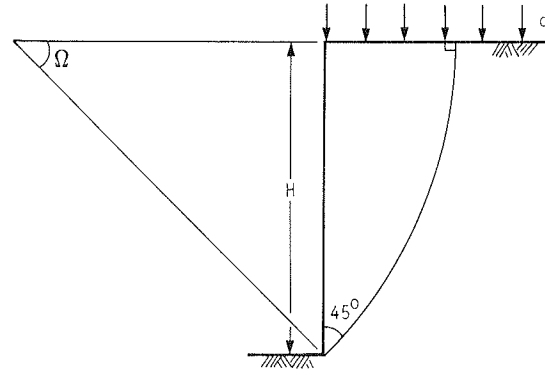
Failure surface in a geotextile-reinforced wall with an uncracked cohesive soil backfill. (Source: Ref. 18)
